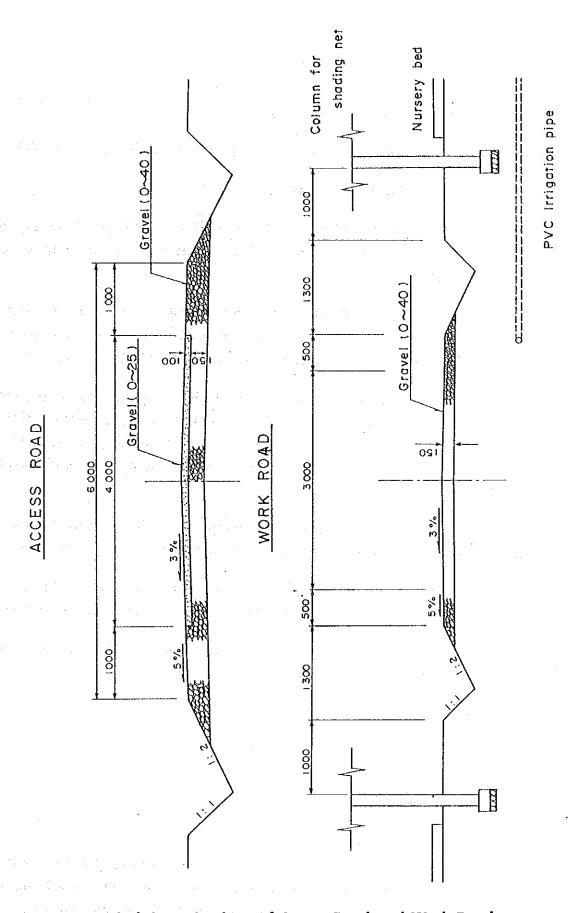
Typical Cross Sections of Access Road and Work Road
